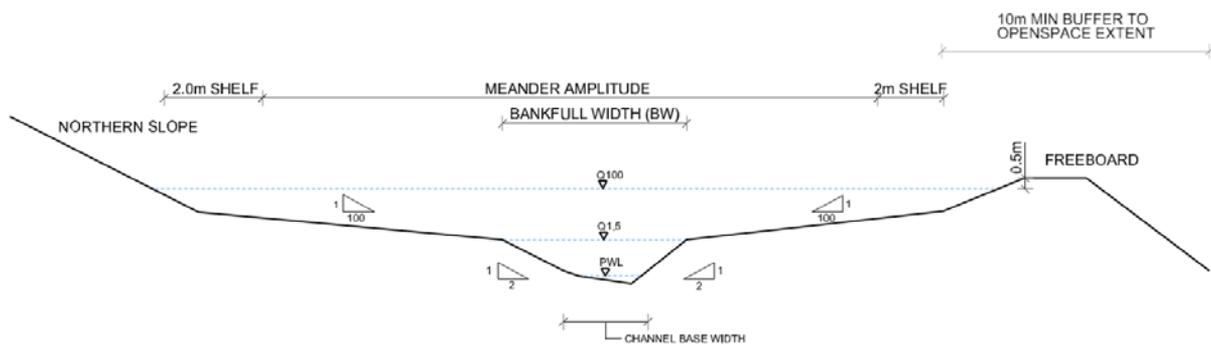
Typical section of the northern realignment in terms of flooding profiles
